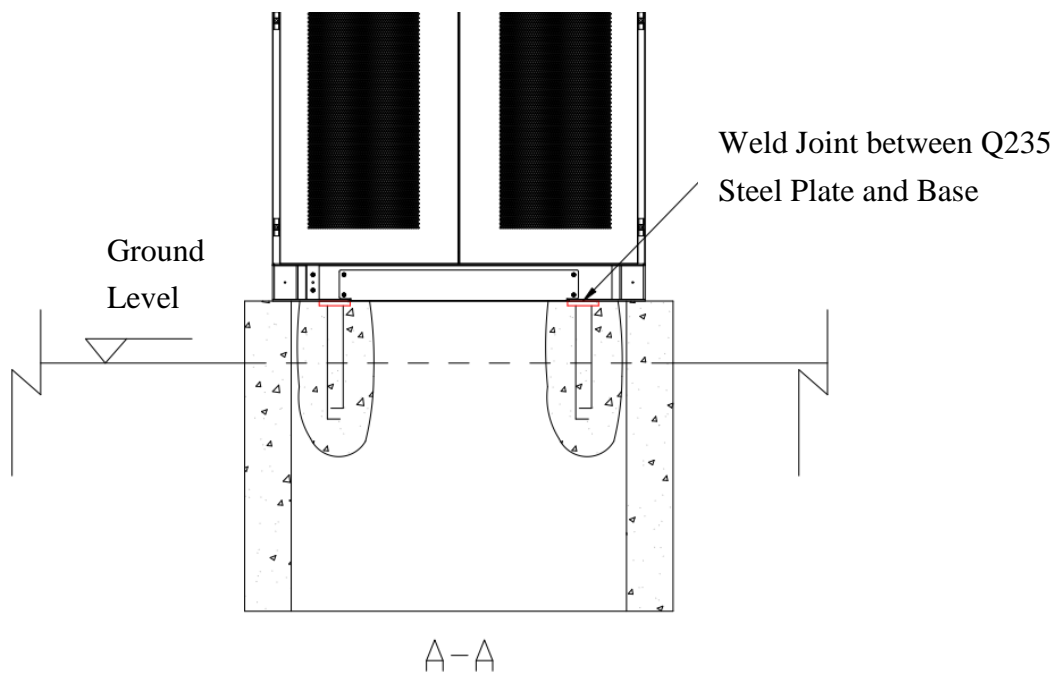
Welding Diagram of Cabinet and Embedded Steel Plate
